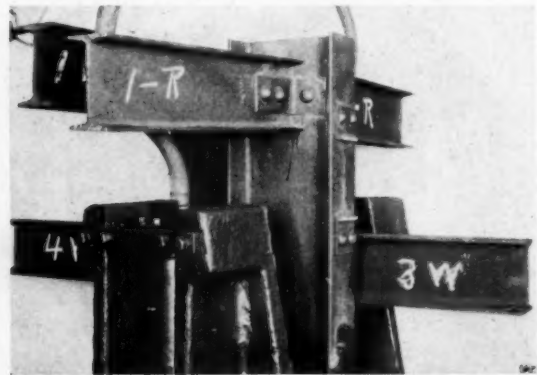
RIVETED VIBRATION TEST PIECE AFTER FIRST TEST
